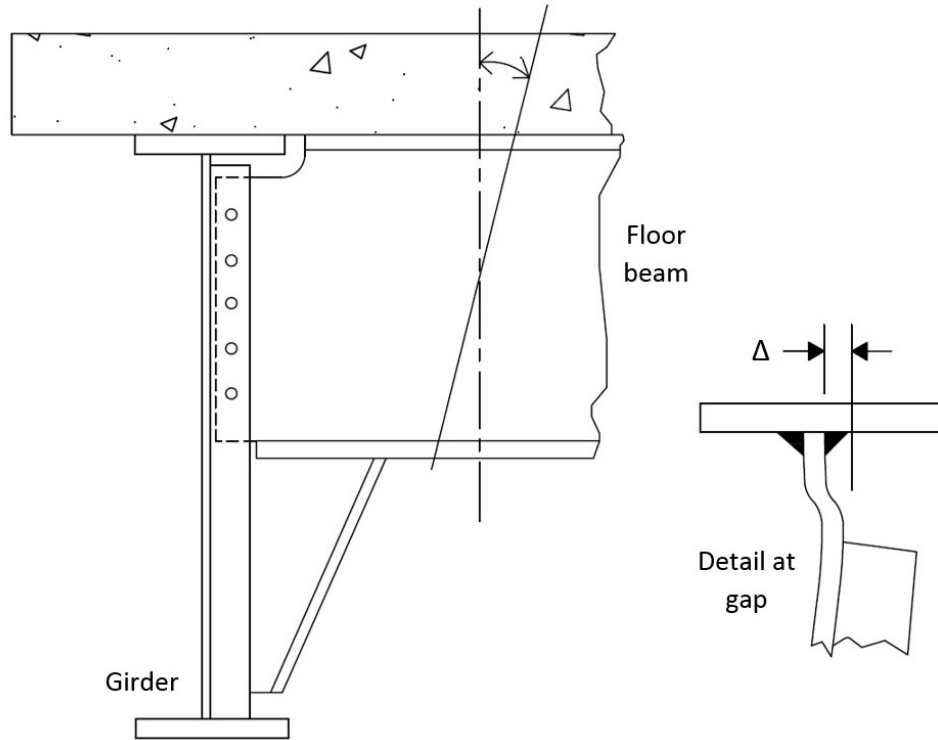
Web gap displacements in a girder-floorbeam steel bridge.
